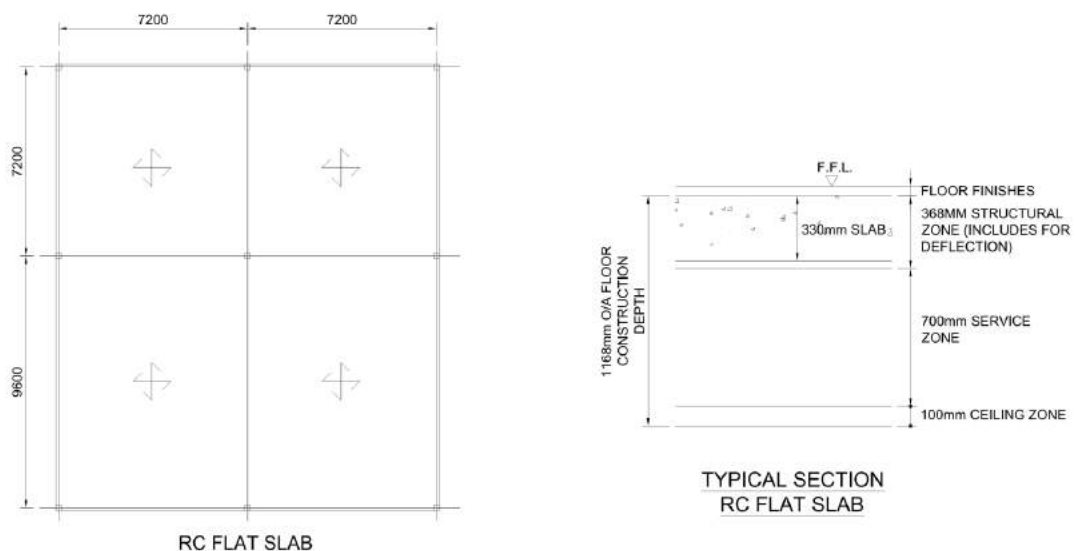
General arrangement and section for a concrete frame and flat slabs
